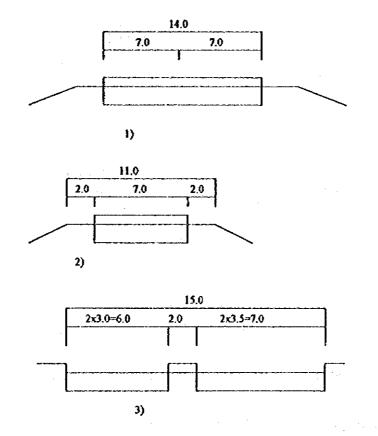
Typical Cross Section of Terminal Roads
